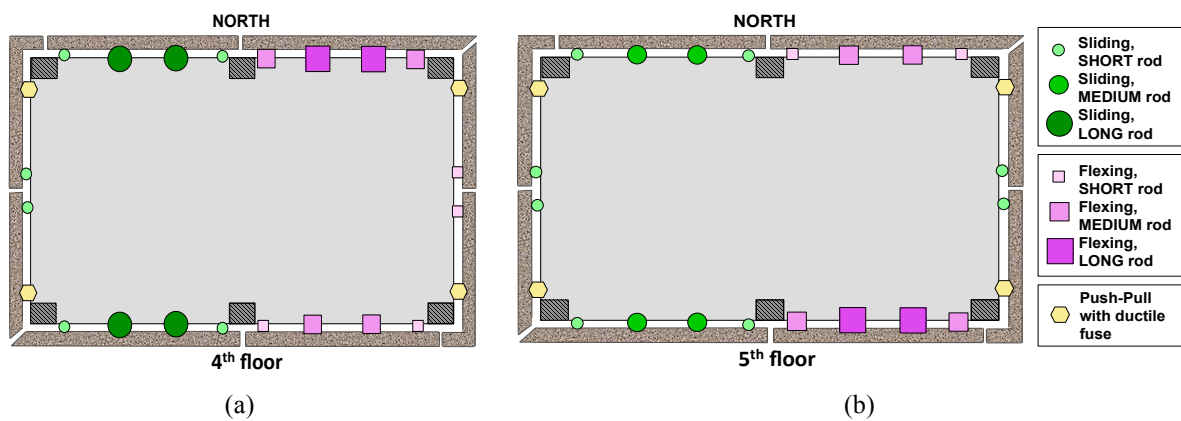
Location of the different types of connections: (a) fourth floor and (b) fifth floor.
